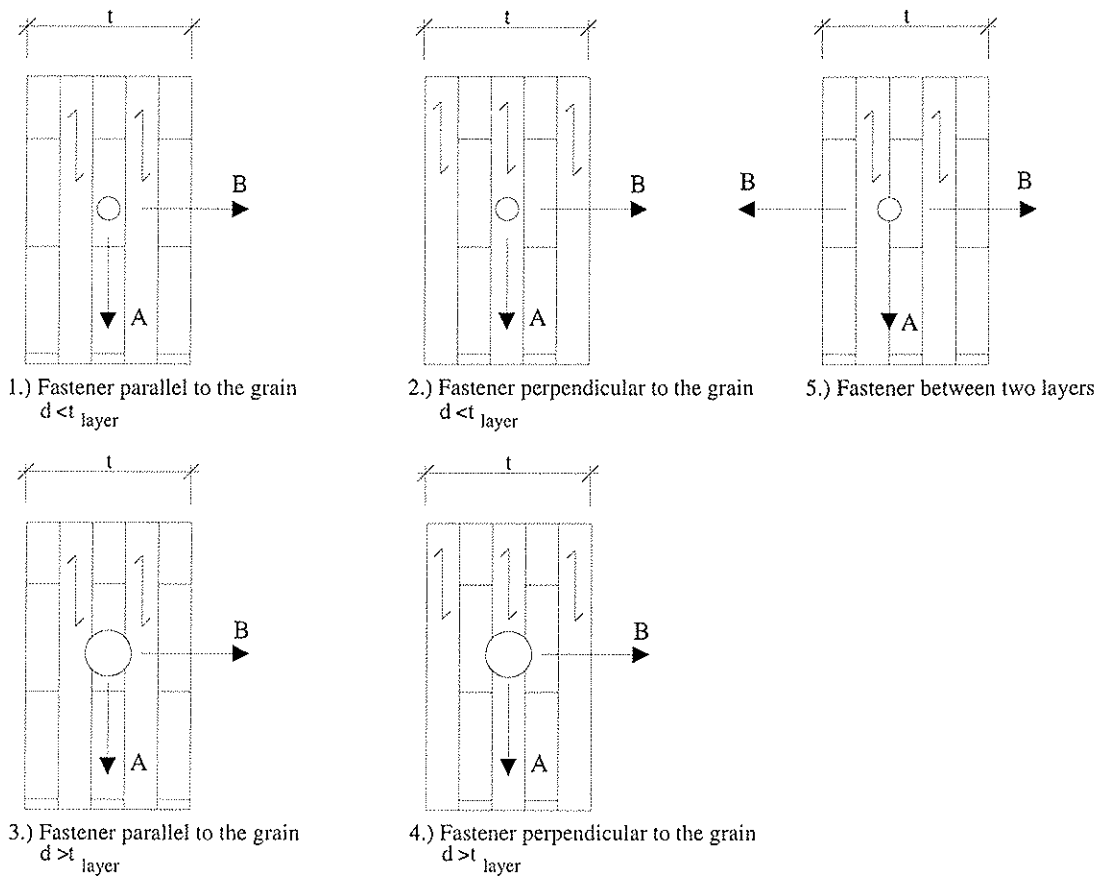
Possible positions of fasteners in the narrow sides, schematic sketch
